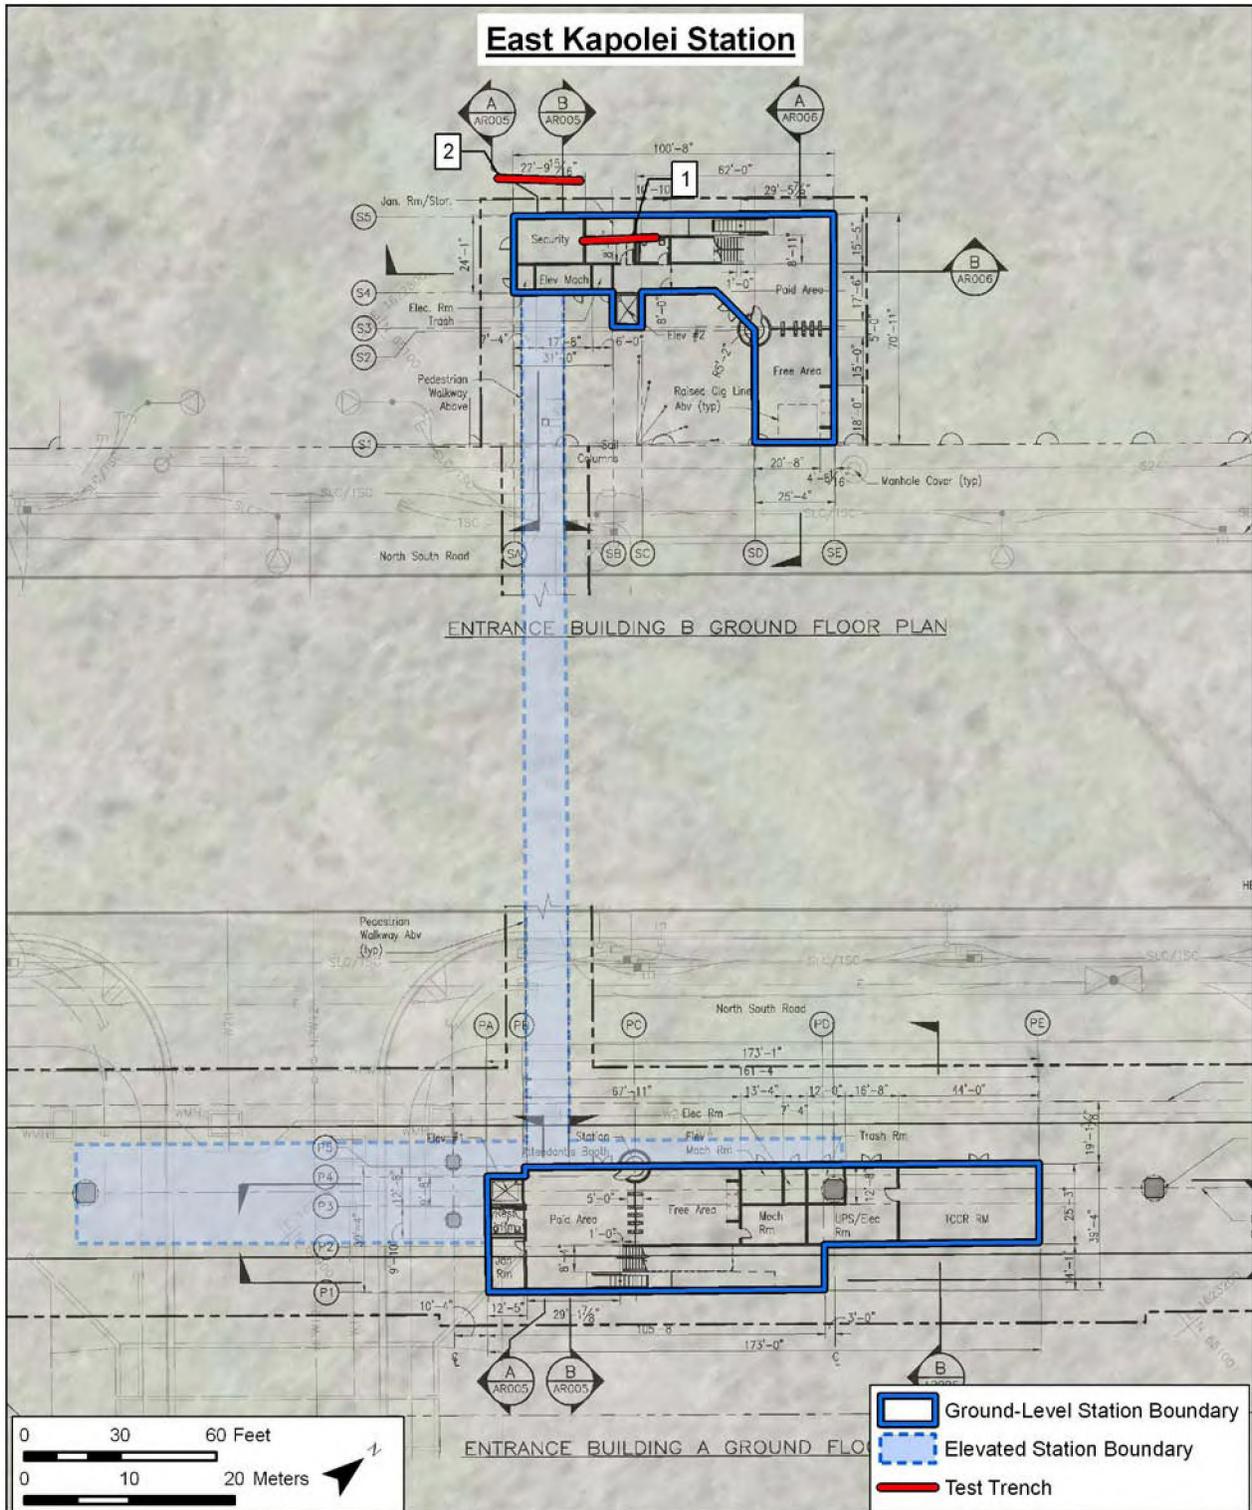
Floor Plan of East Kapolei Station showing location of test trenches
